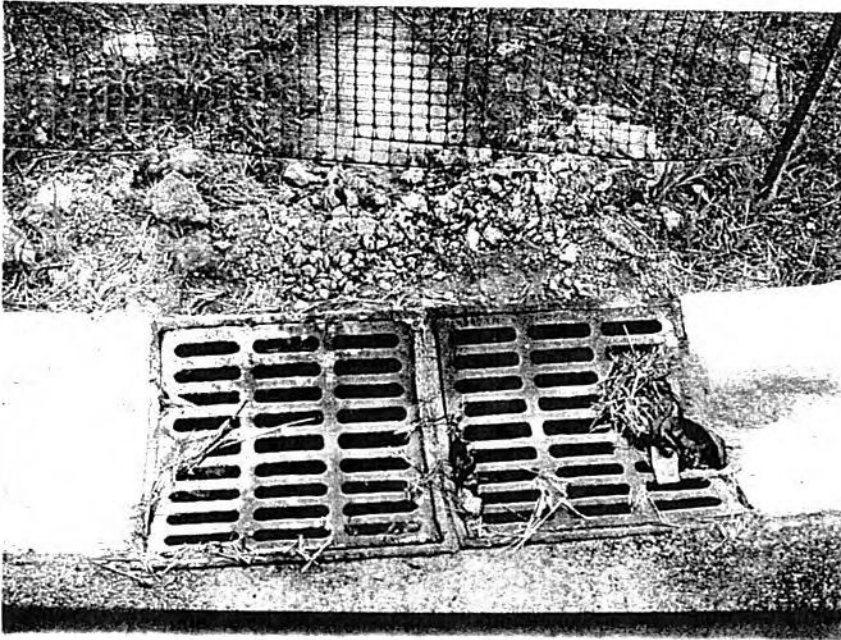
Road inlet in Parcel 4 showing no protection of inlet that drains directly to the lower pond. It also appears that concrete wash out has occurred and has entered the inlet.
